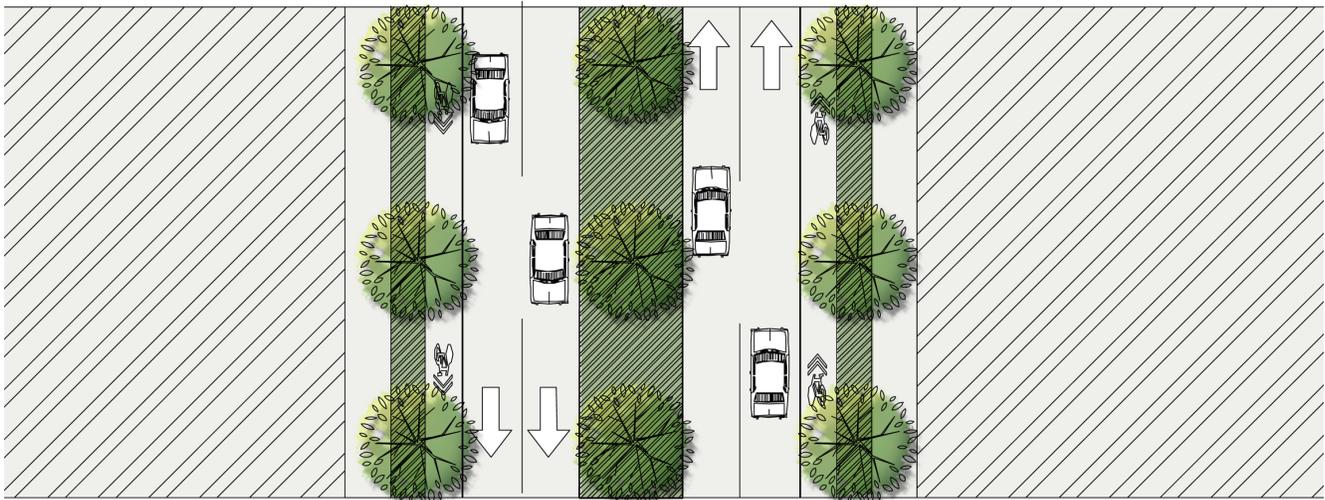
Section, New Boulevard: The “New Boulevard” street section reflects the recommended design for most of Manchester Road, between Baxter and Old State. As mentioned elsewhere in the master plan, the boulevard would over time include a landscaped median as redevelopment proceeds along the corridor in order to improve aesthetic quality and improve safety. A combined sidewalk and bike lane would be separated from the main travel lanes on either side of Manchester Road by a landscape buffer. A shallow bay of parking would potentially flank buildings on either side of the road, but the majority of parking would locate to the rear or side of individual buildings.
